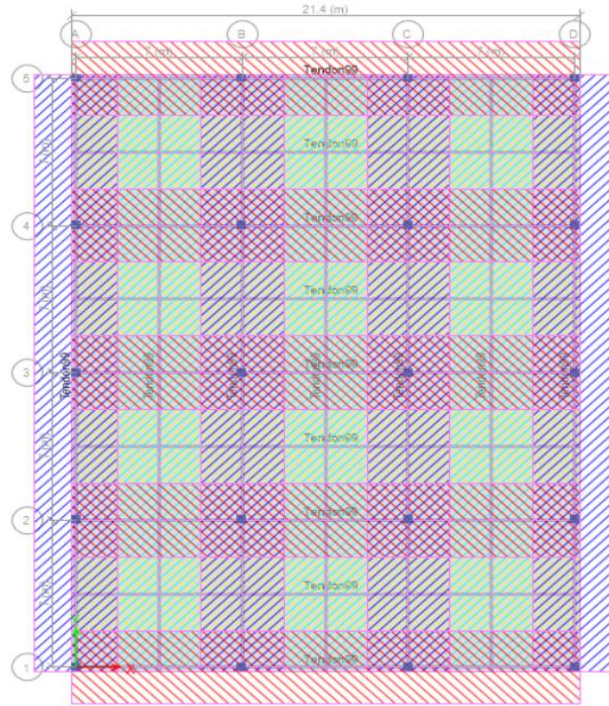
PT flat slab Tendons layout in layer A and B strip directions
